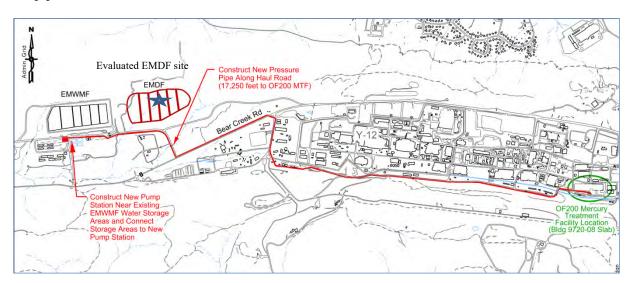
Alternative 4a: route of pipeline to Outfall 200 MTF.
